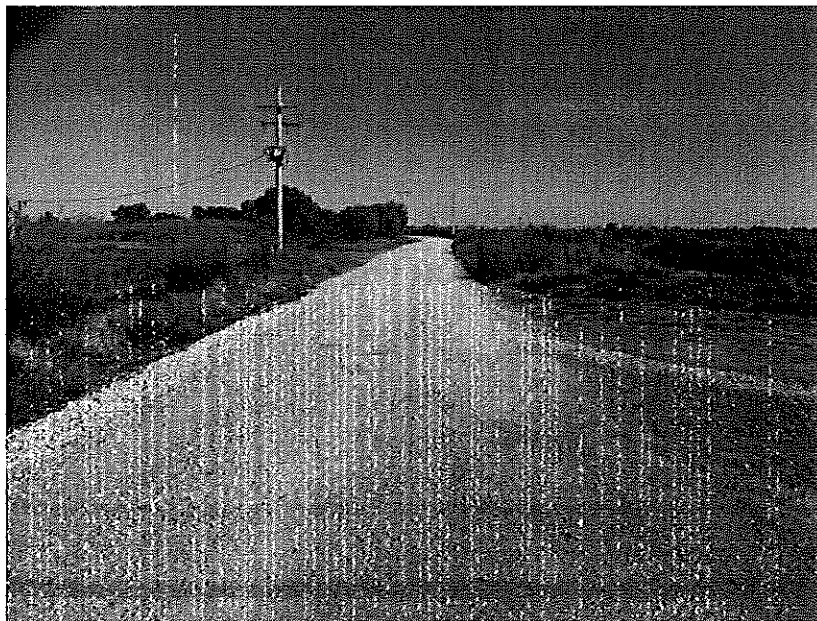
Mirrool Branch Canal Road. Photo taken from Mirrool Branch Canal Road looking south-west.
